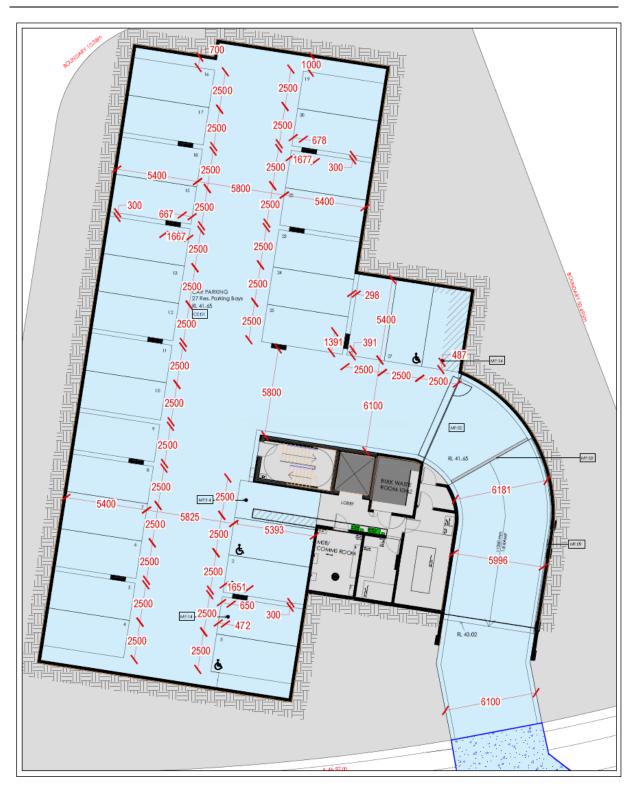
PROPOSED CAR PARKING DIMENSIONS
